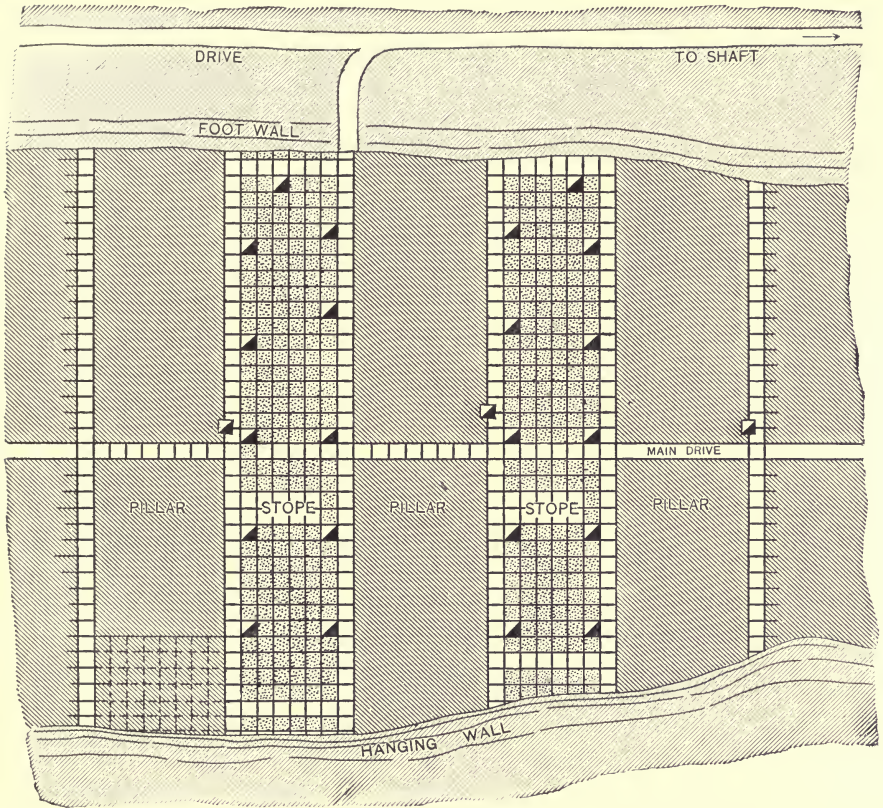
Plan of Pillar-and-Stope Method in Broken Hill Mines.
